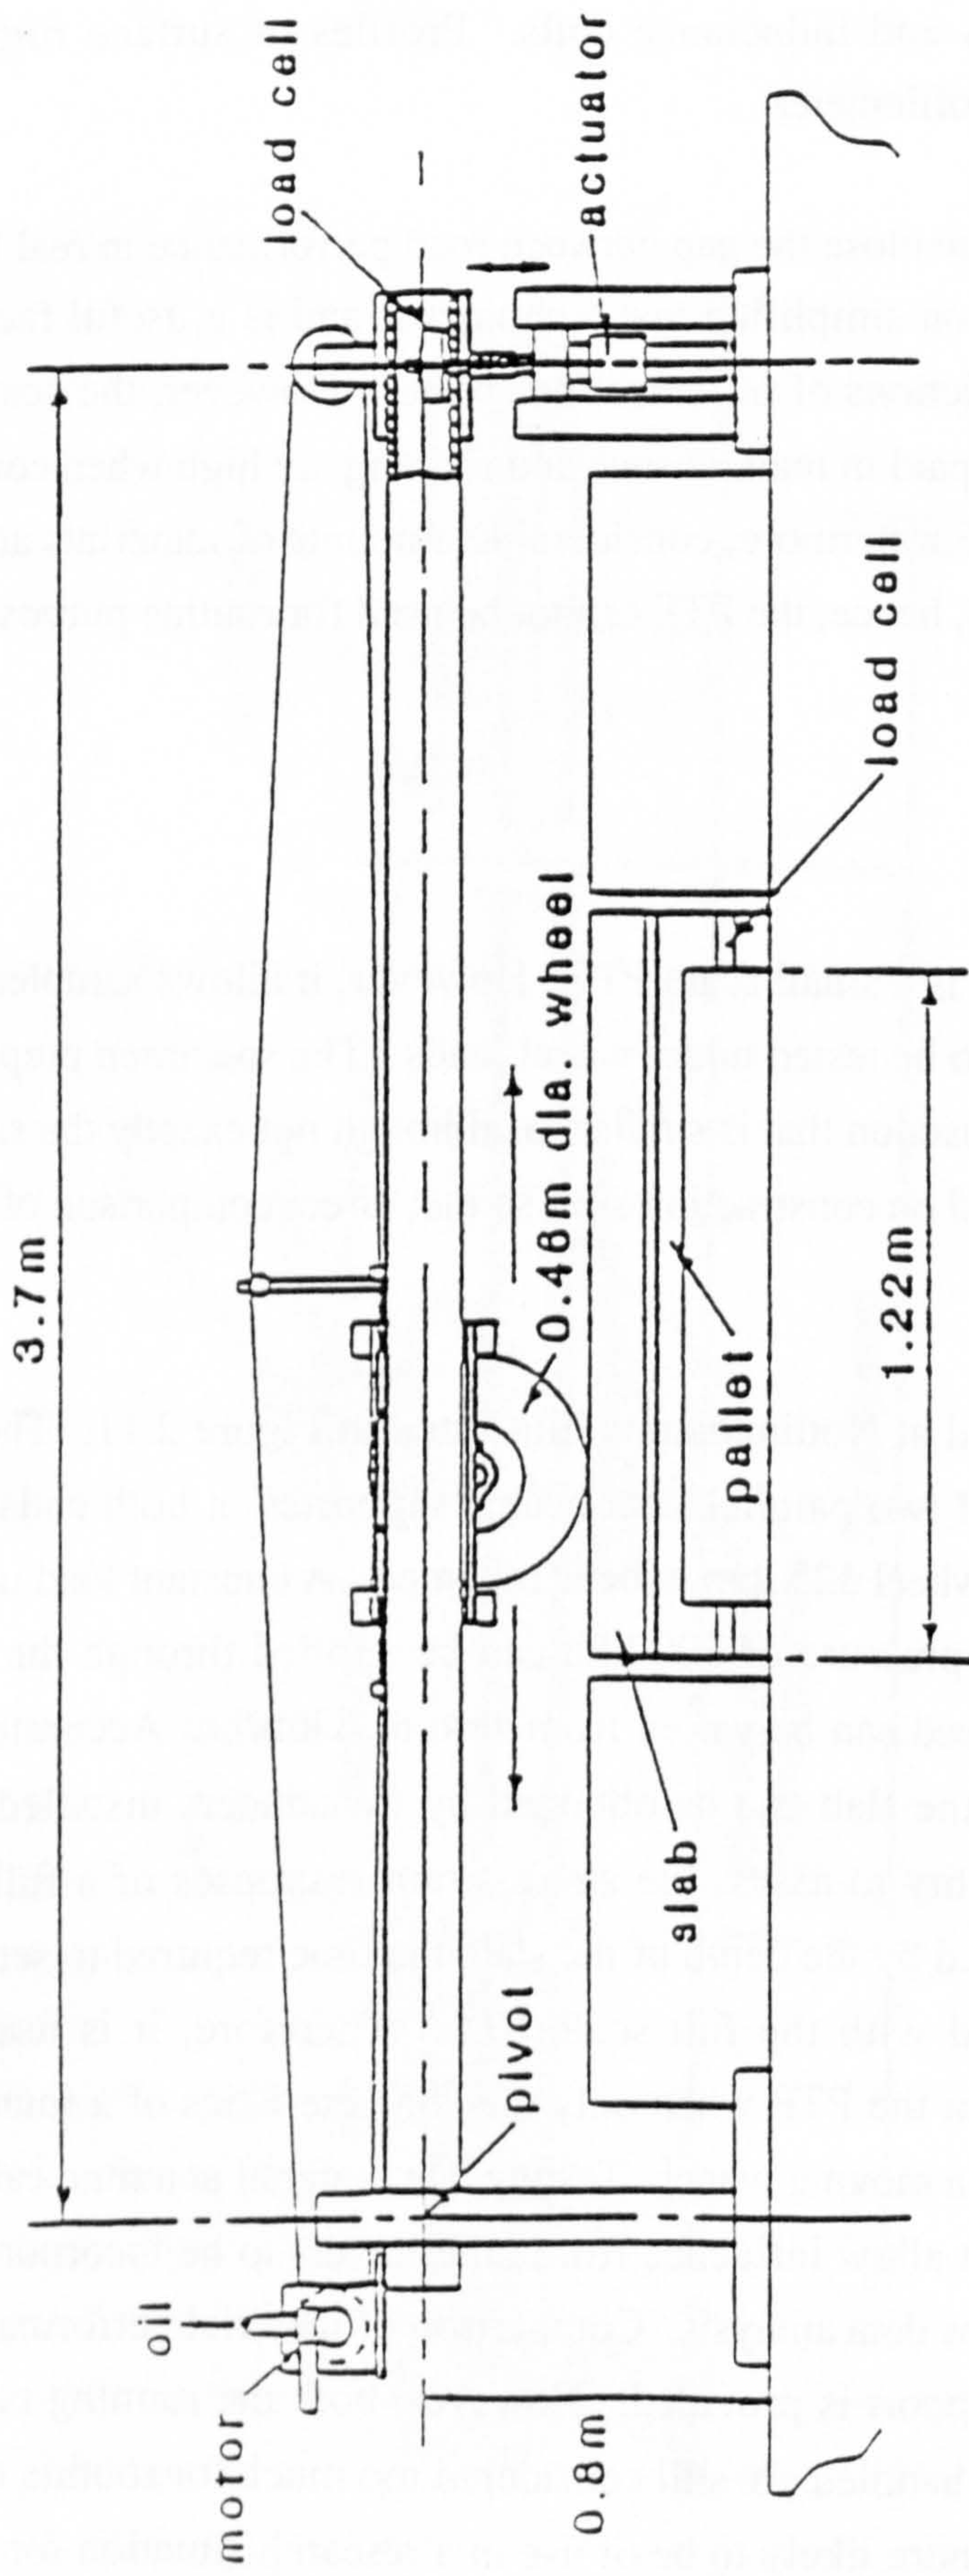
Elevation of the slab test facility (Chan 1990)
